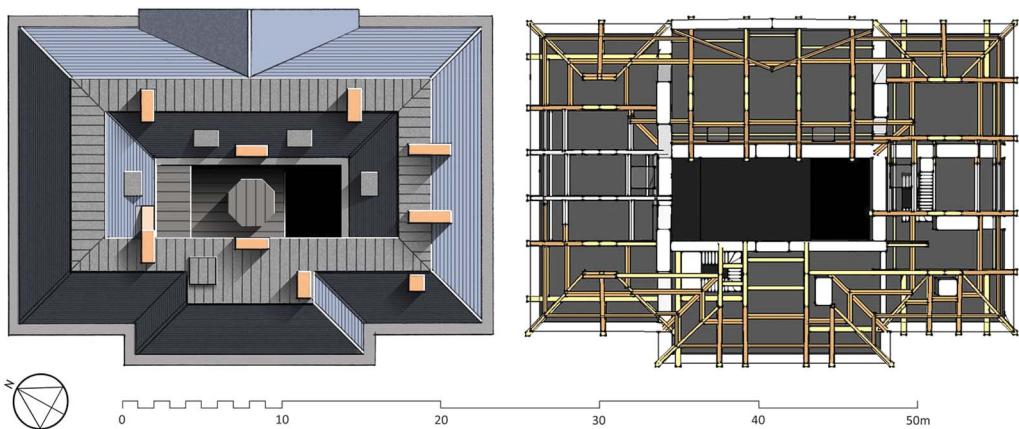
Moor Park: reconstruction plans of the roof and its framing. Existing structure coloured; presumed structure in outline. *Survey:* Paul Drury. *Drawings:* David Wrightson
